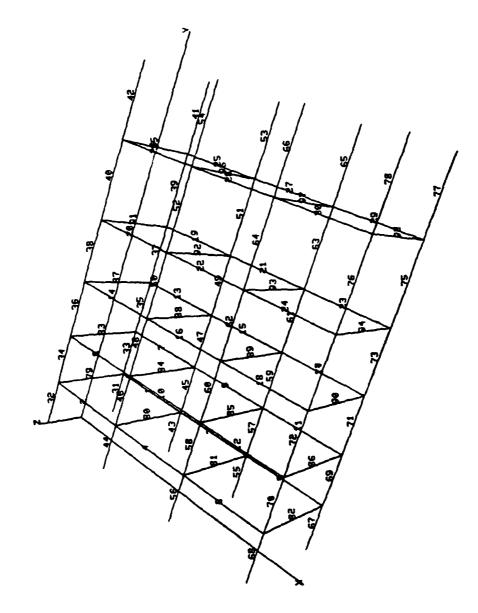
Specimen | Finite Element Model - Cap Bar Elements.
